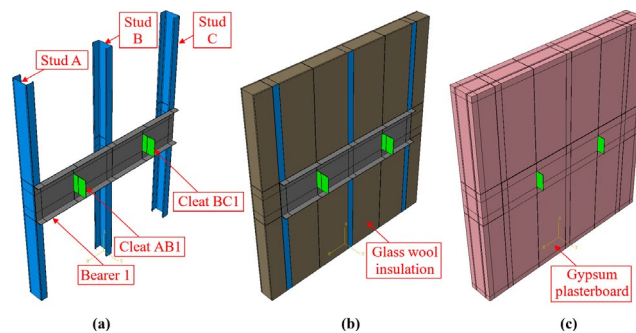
Modified thermal FE model 2 with (a) glass wool insulation and gypsum plasterboards hidden, (b) gypsum plasterboards hidden, and (c) all details.
